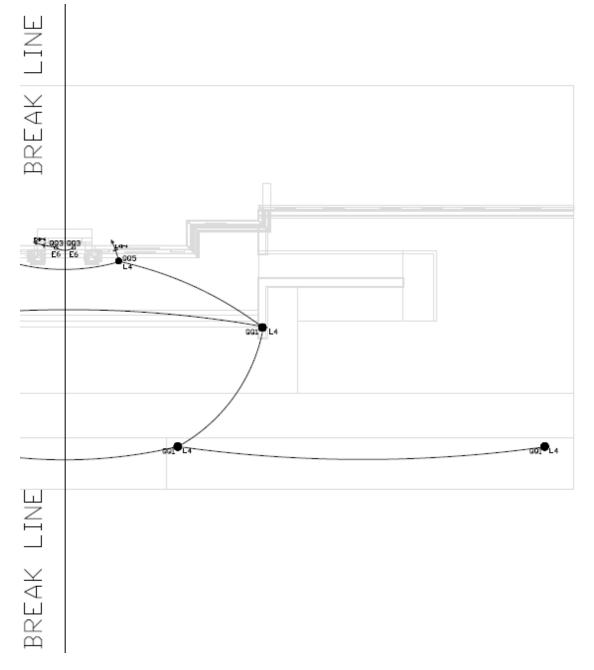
First Floor Circuiting Plan for East Entry and Façade – North Of Entrance
